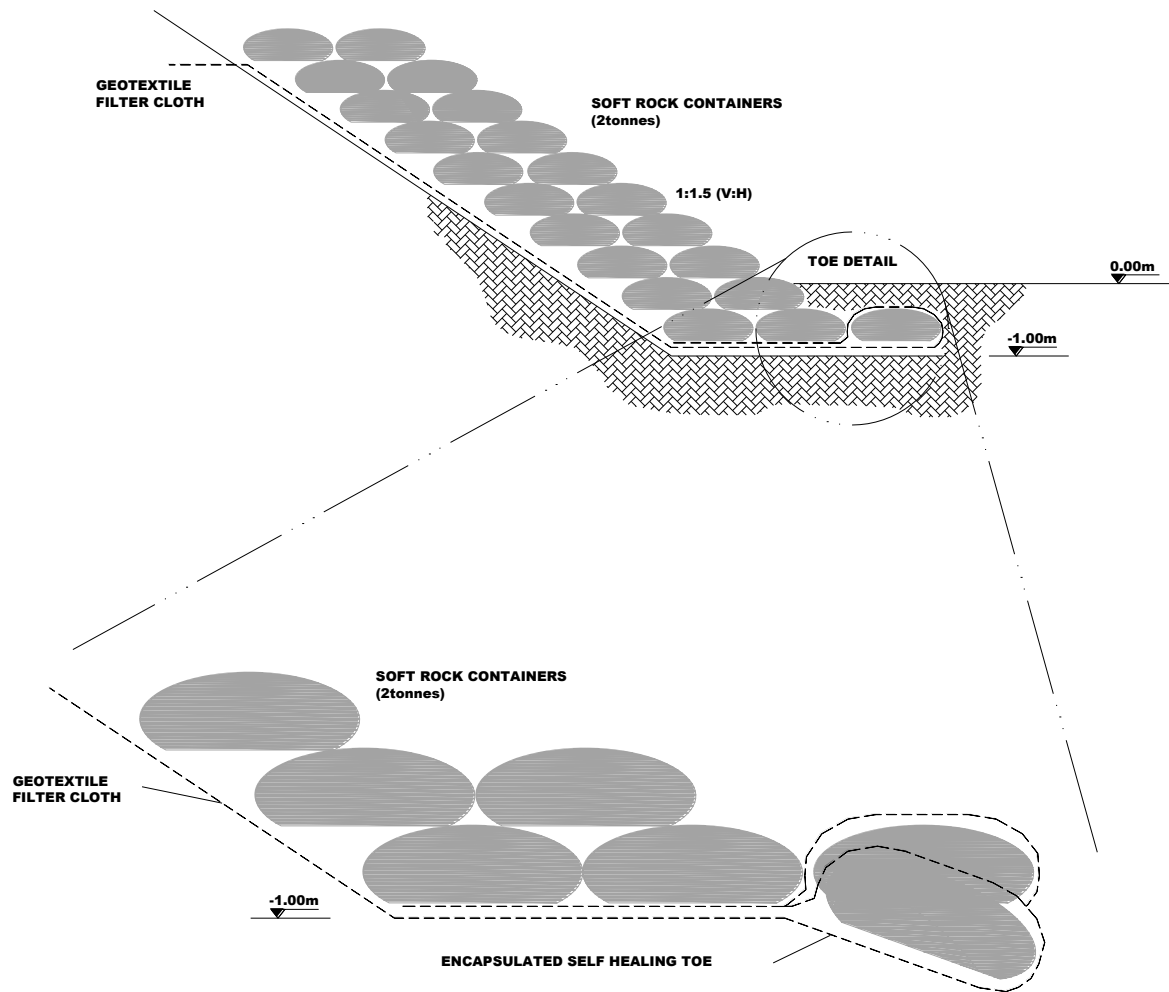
Typical cross-section of the revetment at the Stockton beach, Australia
